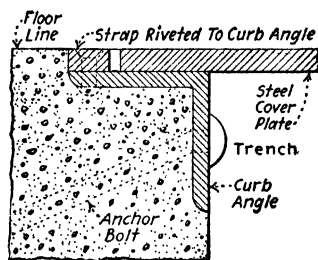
Detail of sheet-steel trench cover and curb angle. Cover plates should have $1\frac{1}{2}$ in. holes in them for lifting.
